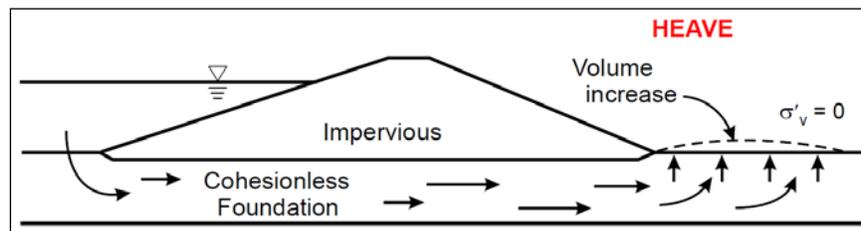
Heave at the toe of an embankment (Pabst et al. 2013).
